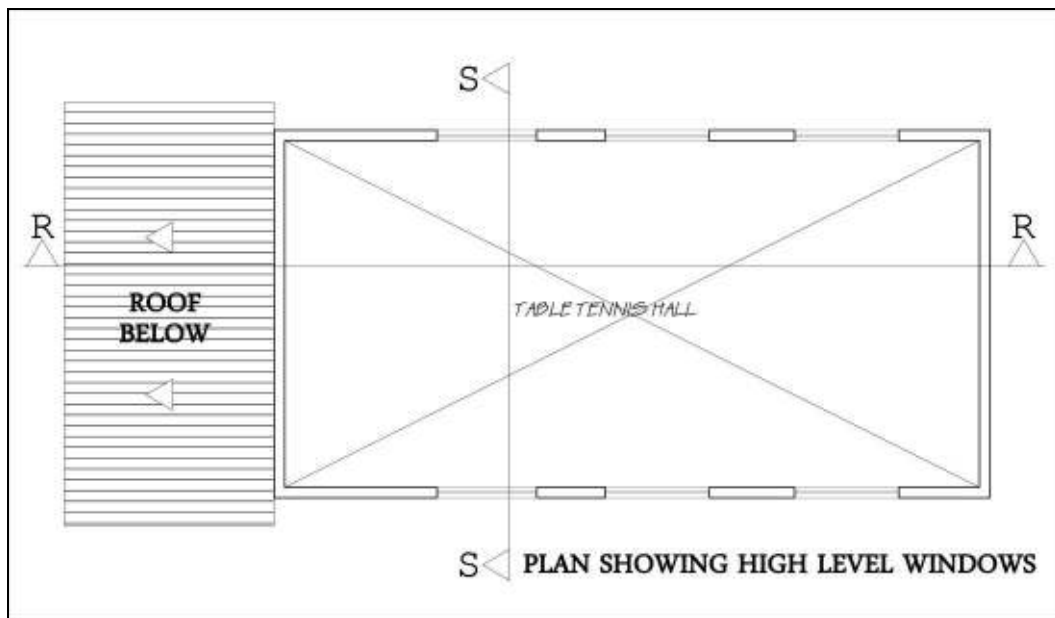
Showing floor plan (with high level windows) of FUTA indoor
